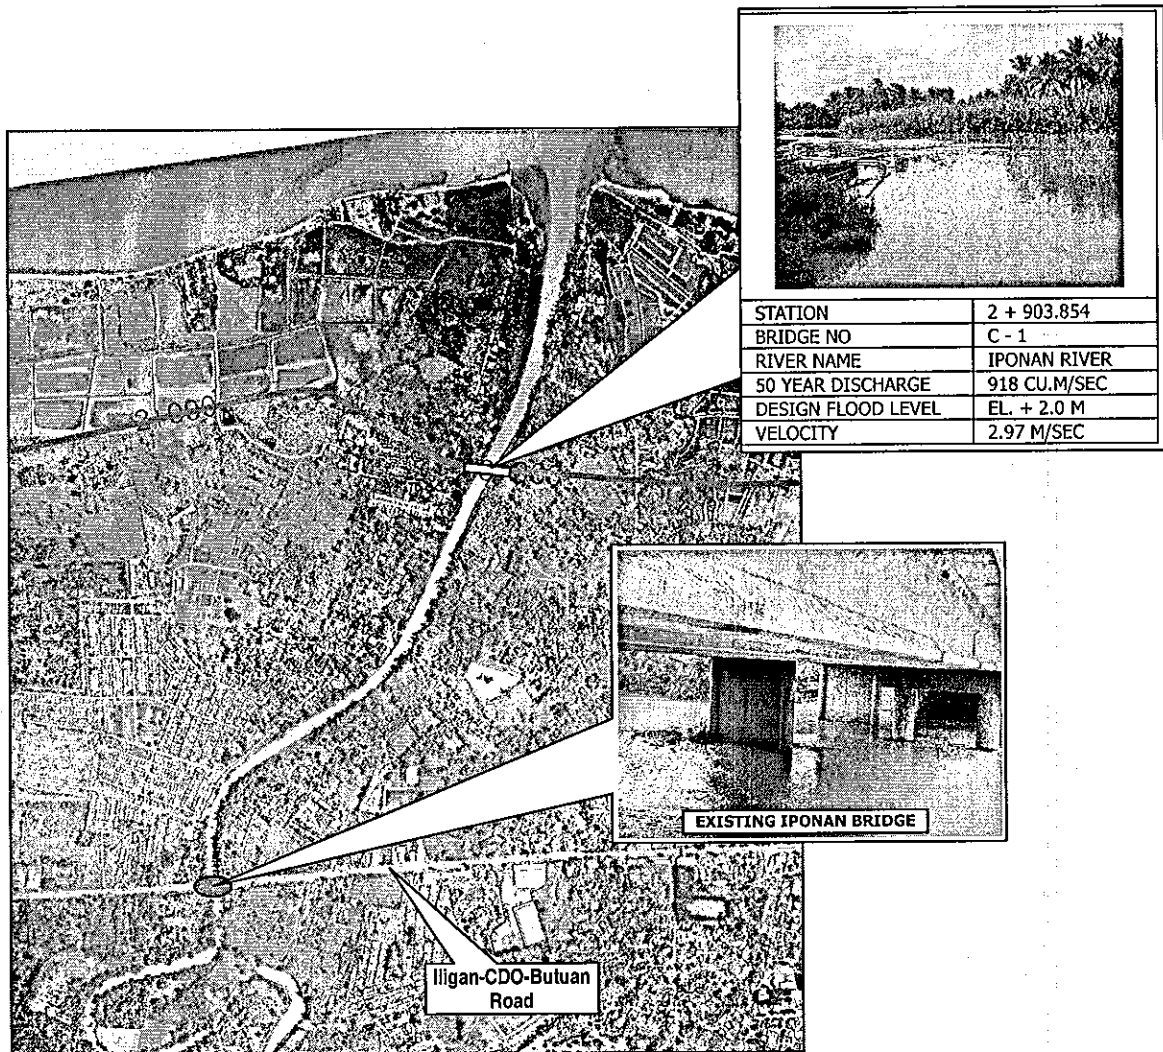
RIVER CONDITION AT PROPOSED BRIDGE SITE
